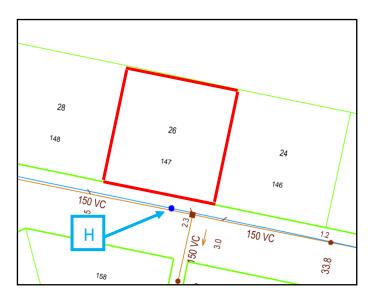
Section Sydney Water Reticulated Mains Water Supply Layout Plans
